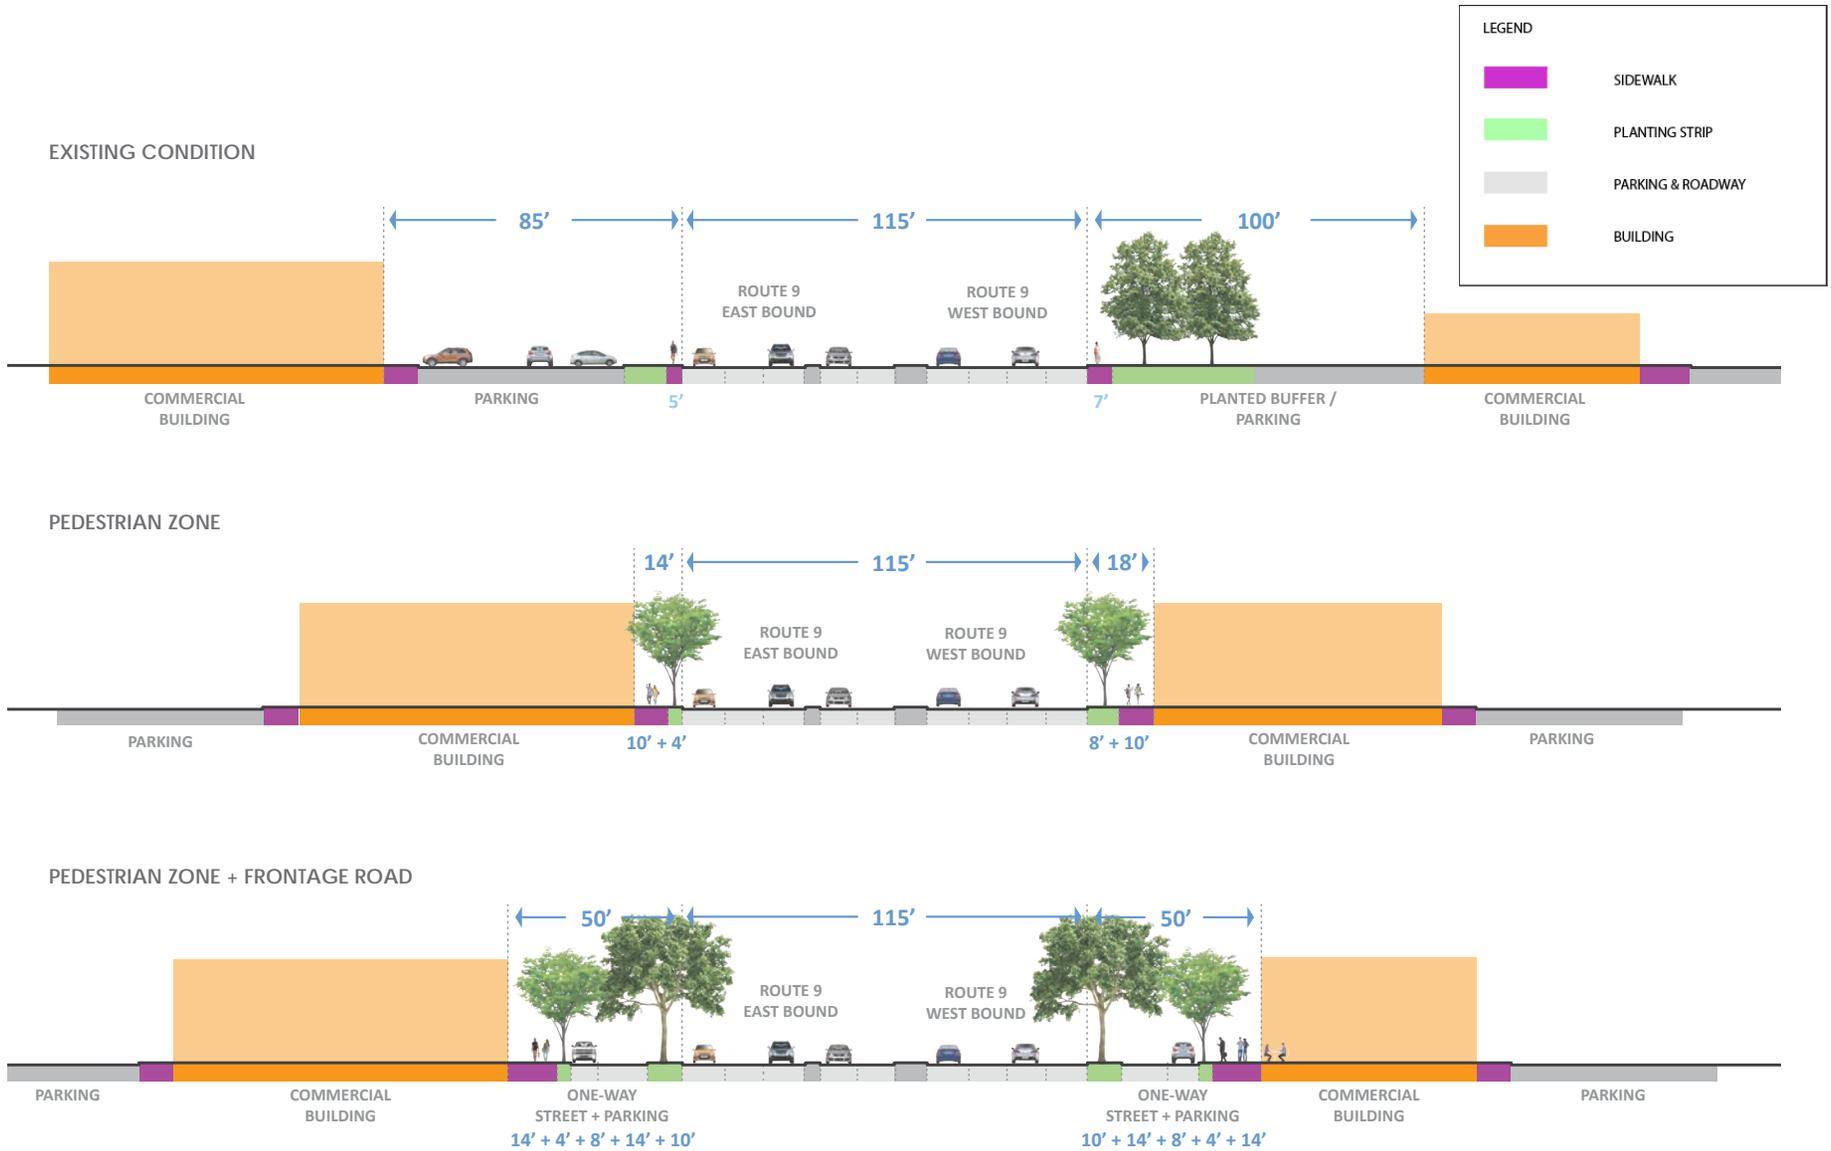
30: Cross sections illustrate (from the top) typical existing building placement on Route 9 with narrow sidewalks and large parking lots; placement of the buildings closer to the street with wide sidewalks and landscaping in front of the buildings and parking behind; suggested frontage road, landscaping and wide sidewalks in front of the buildings, and parking behind.
